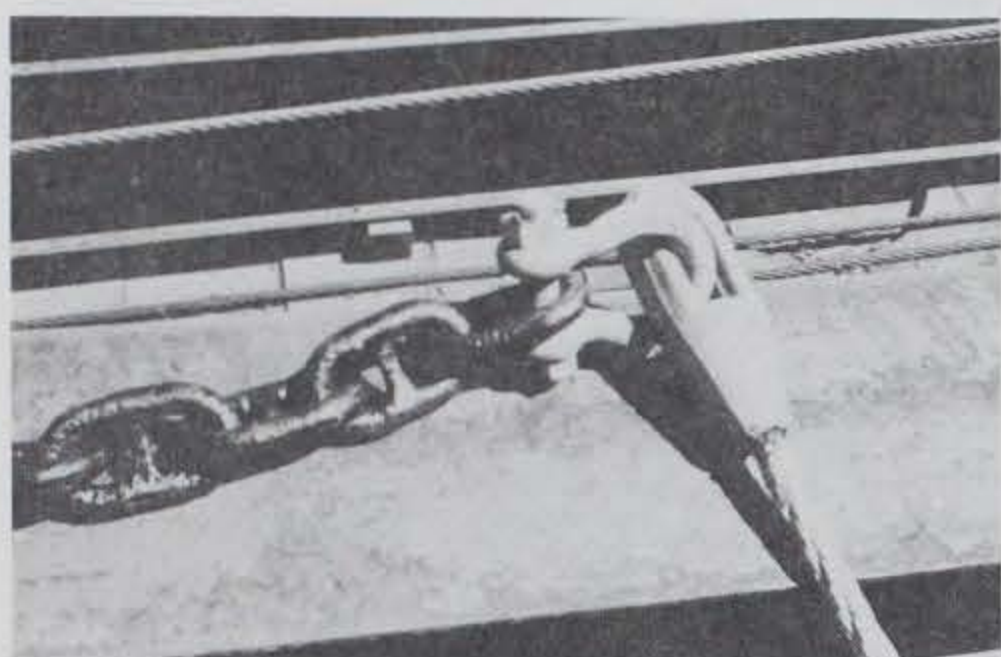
Photo showing attachment of lower chain to steel bridge rope.
